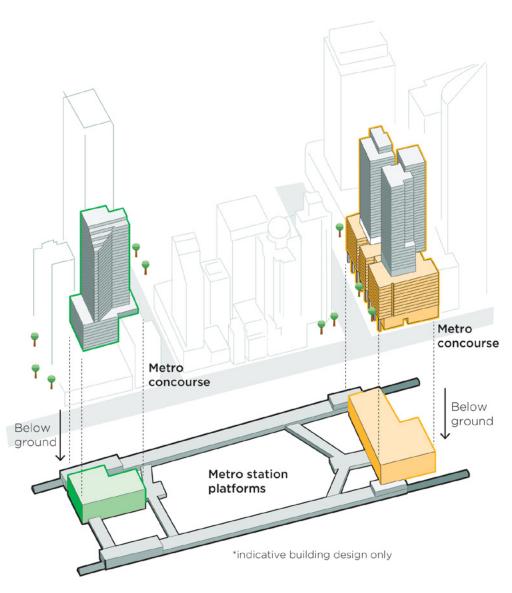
Relationship between Pitt Street North OSD, Pitt Street South OSD and Pitt Street Station
